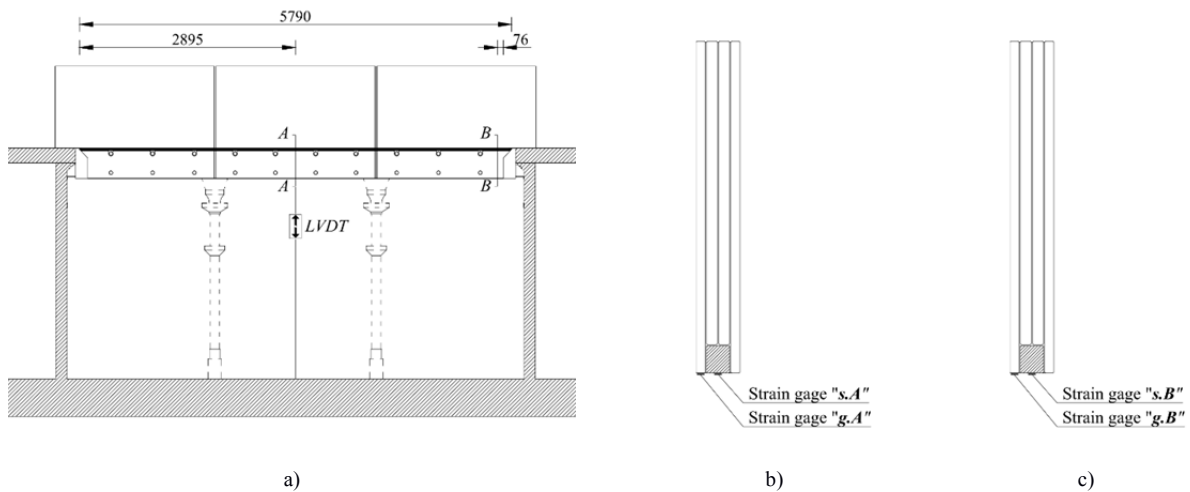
Position of the LVDT and position of the strain gages on the beam, b) Cross-section A-A, c) Cross-section B-B.
